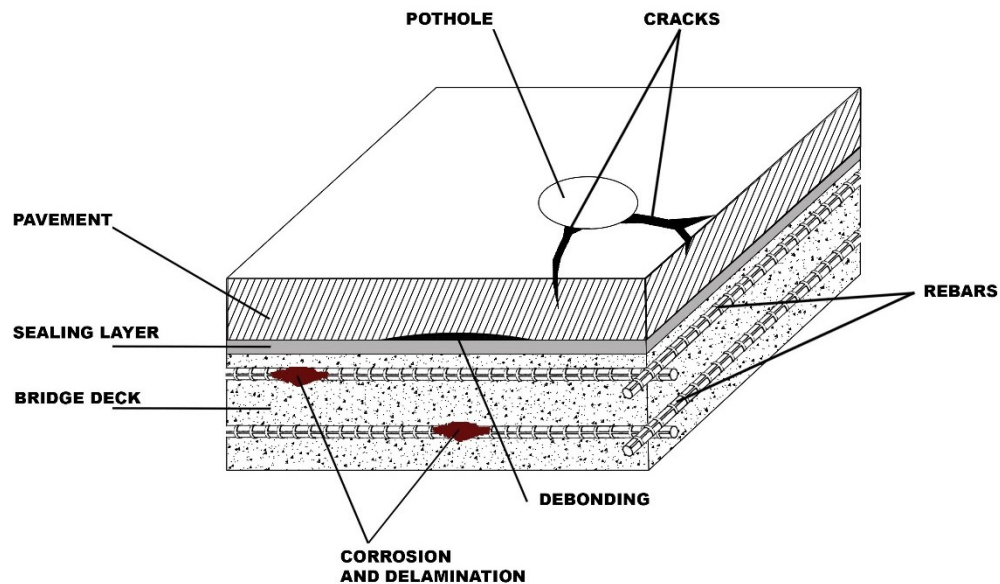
Some defects in concrete bridge deck elements
